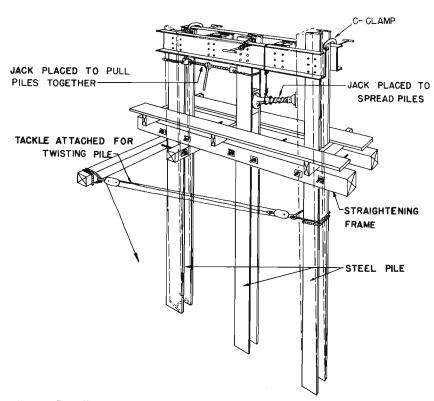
Pulling steel piles into position before drilling to connect cap and bracing.
